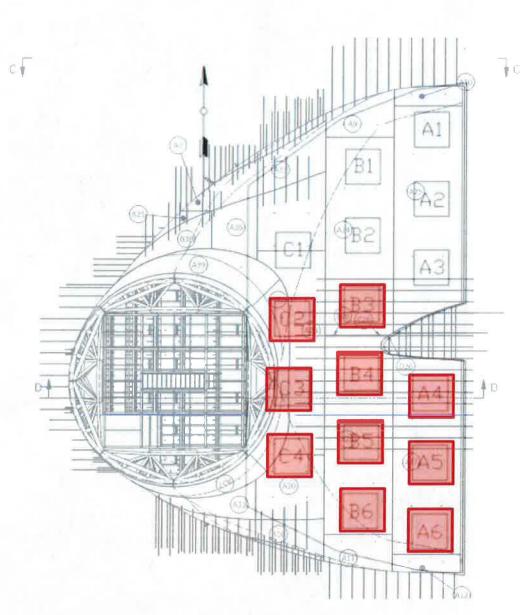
CEI Wooden shoring towers damaged in the collapse
